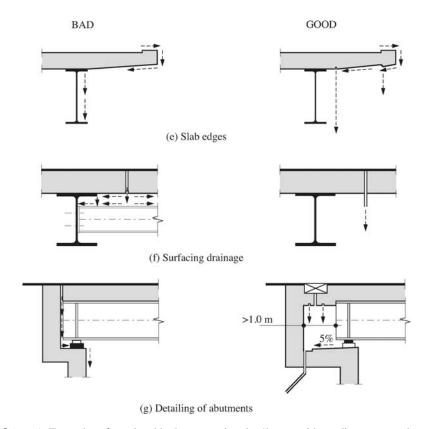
(cont.) Examples of good and bad construction details to avoid standing water and moisture.
